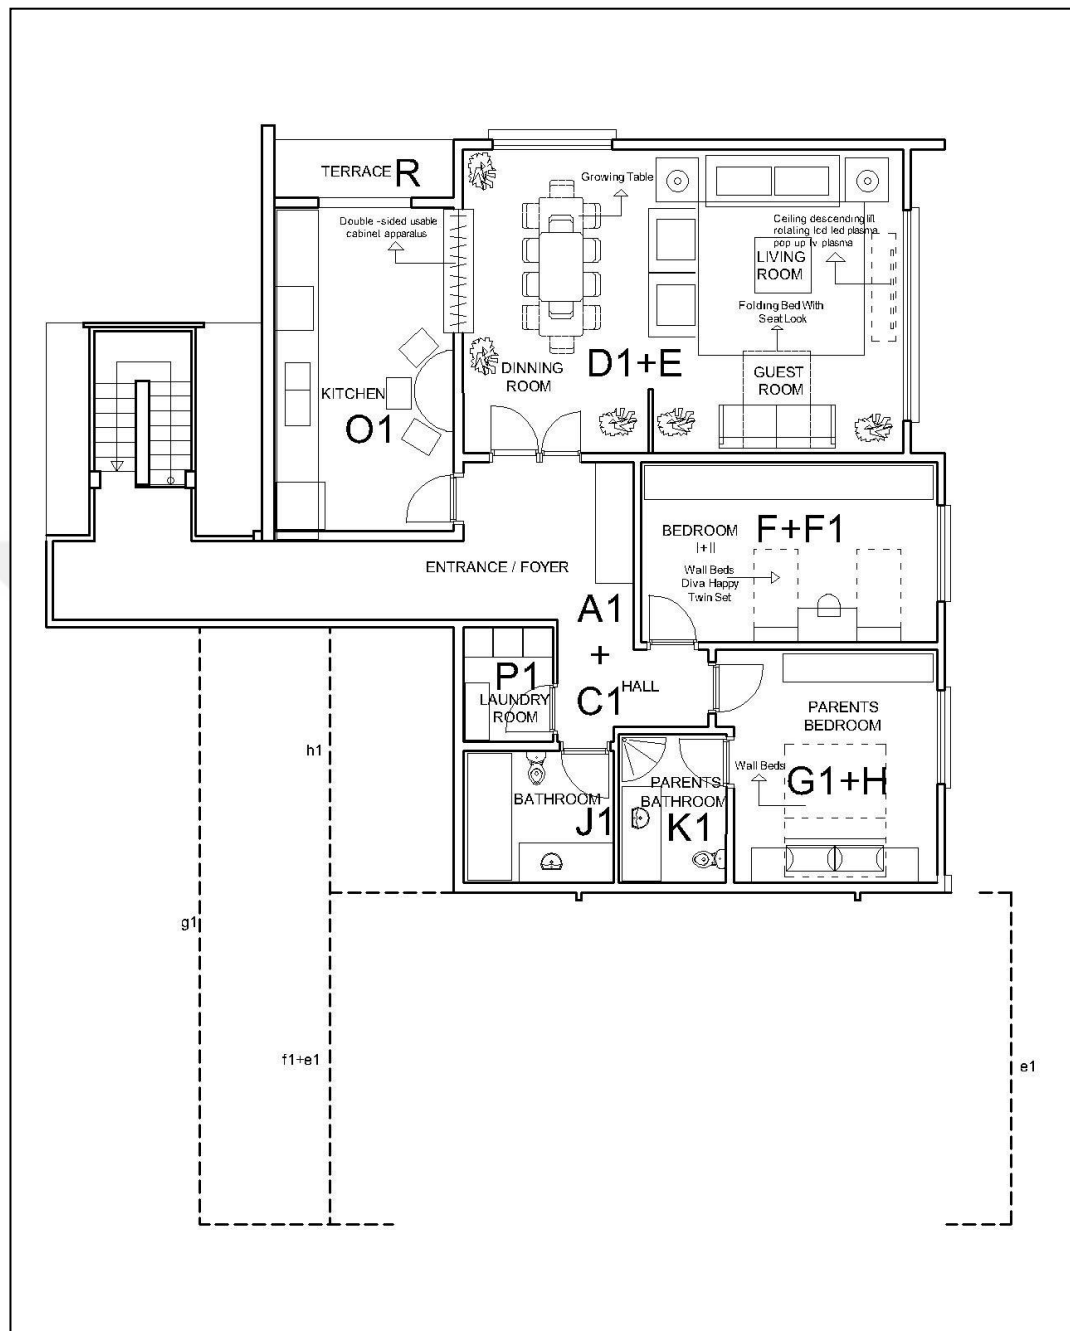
Secondary change of the upper floor plan, designed by author.
